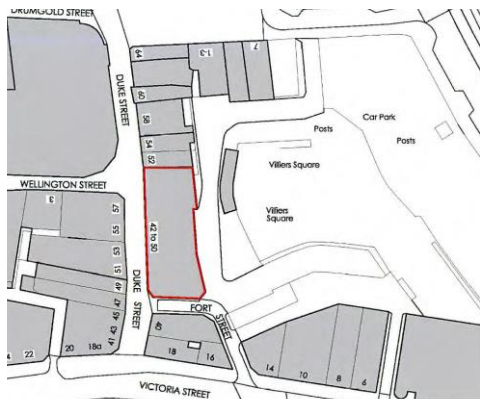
Extent of application site currently under construction (18/00641/B)
